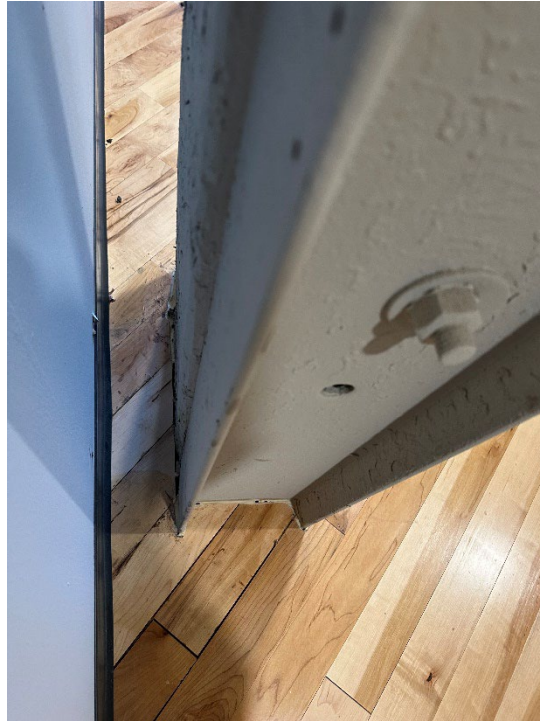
Posts are not sealed all the way around and the wood beams are very porous
